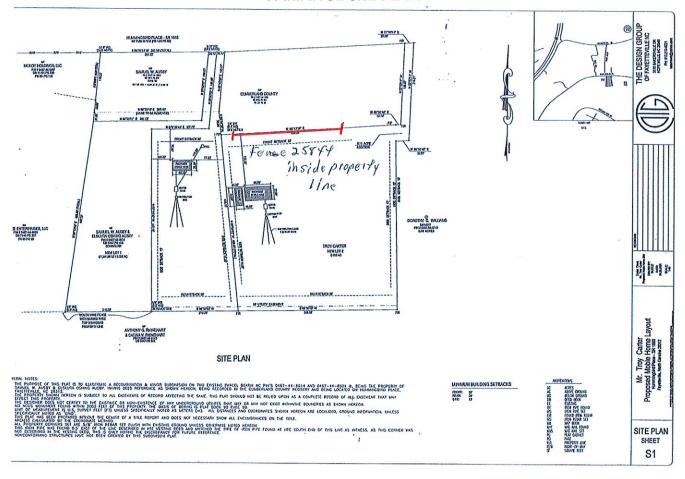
" EXISTING AND SURROUNDING USES
